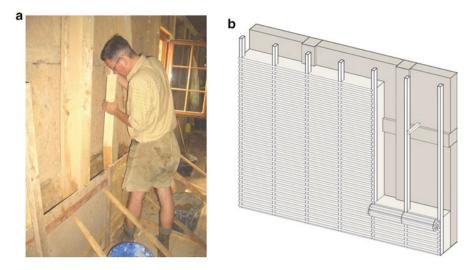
Thermal insulation of half-timber construction: wall lining made of a light-clay mix which is installed wet. (a) Temporary formwork [86] and (b) permanent formwork, reed mat [59]
